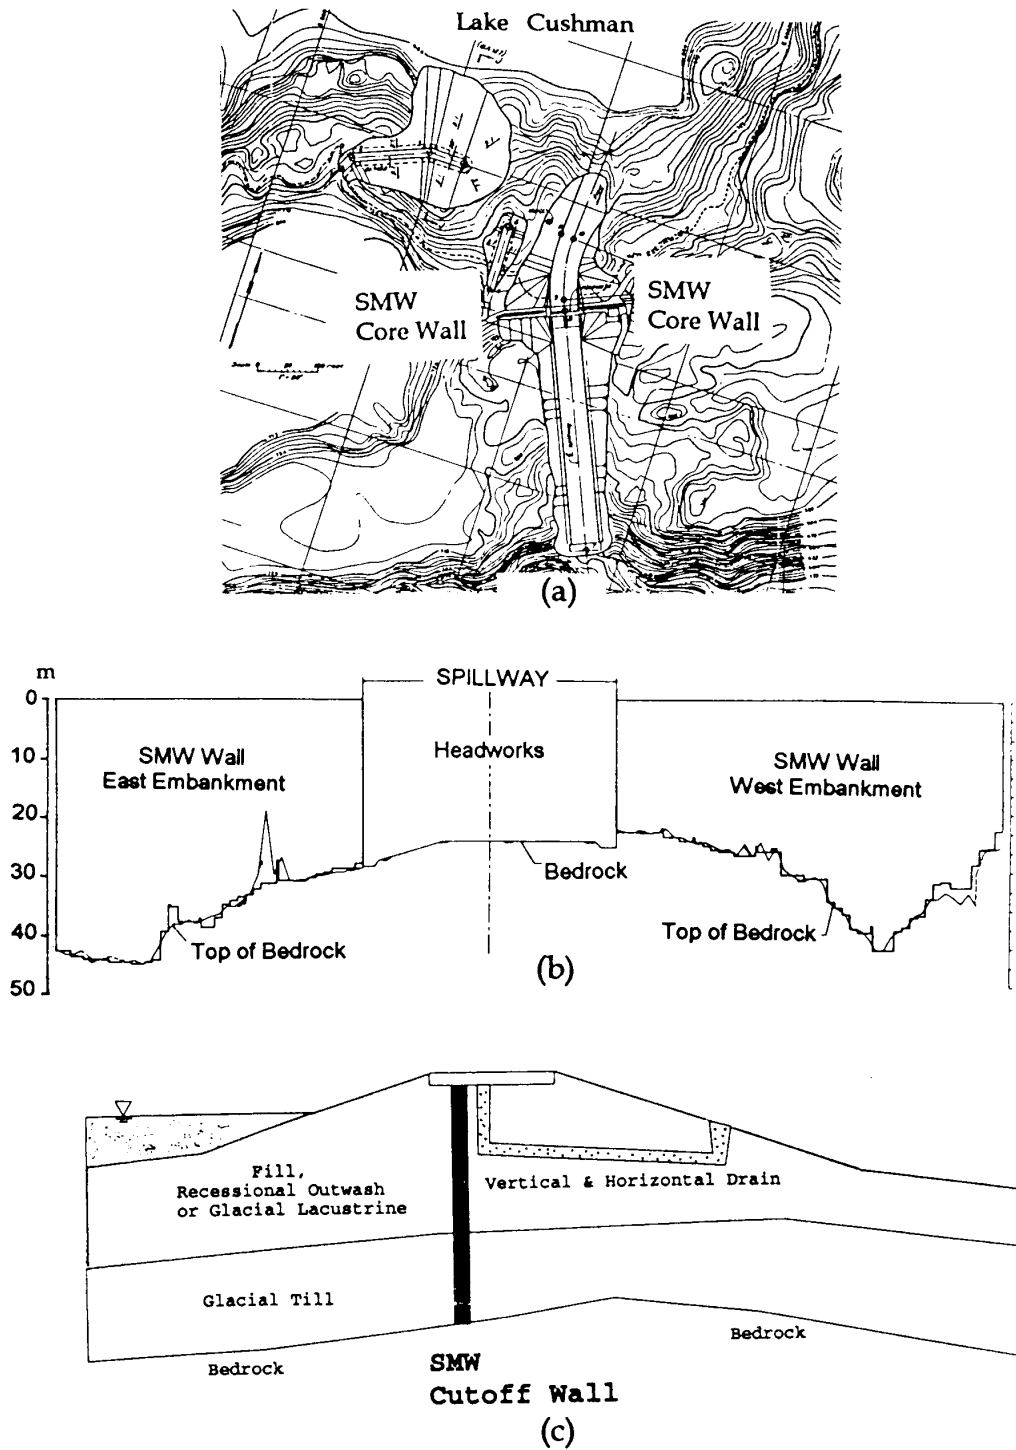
Lake Cushman spillway: (a) site plan; (b) cutoff wall profile; (c) simplified general cross-section (Yang & Takeshima, 1994)
